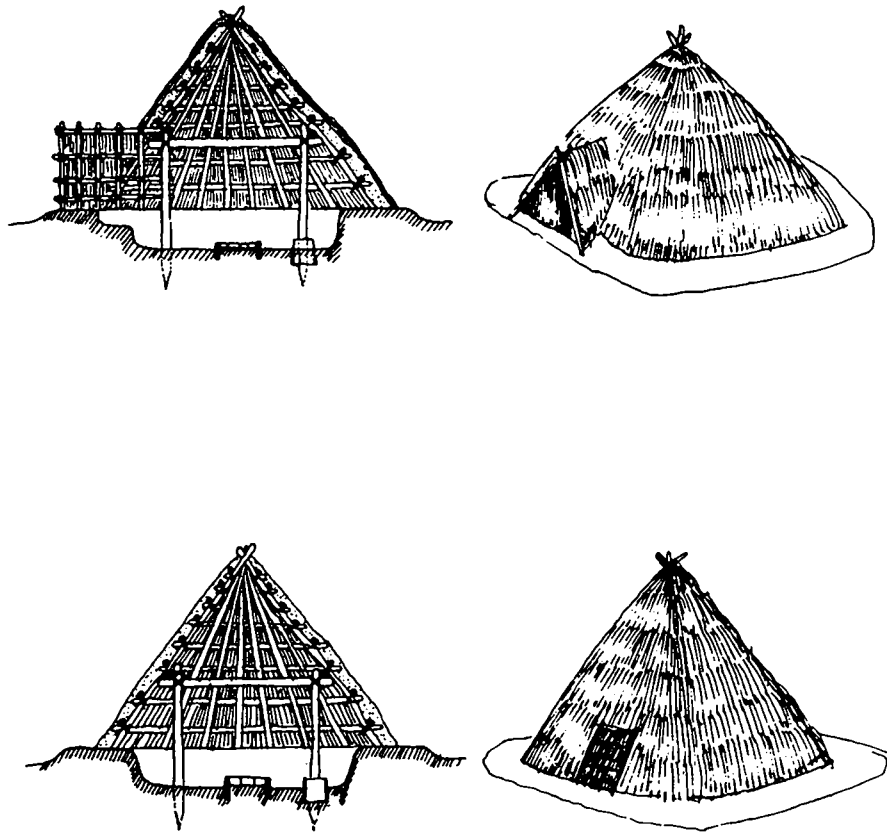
Reconstructed sections and perspectives of two Neolithic dwellings (no scale)
